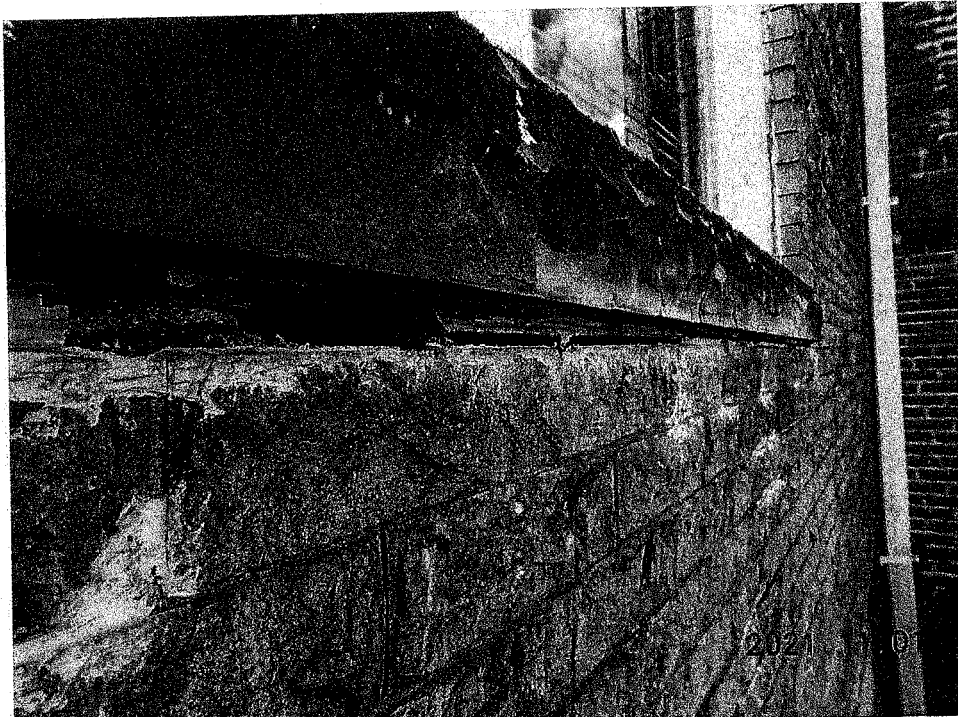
Routine Repair 6 – Deteriorated mortar joint under stone masonry windowsill. Sill is back pitched. – North Elevation, Grid 3: Ht. 10'
